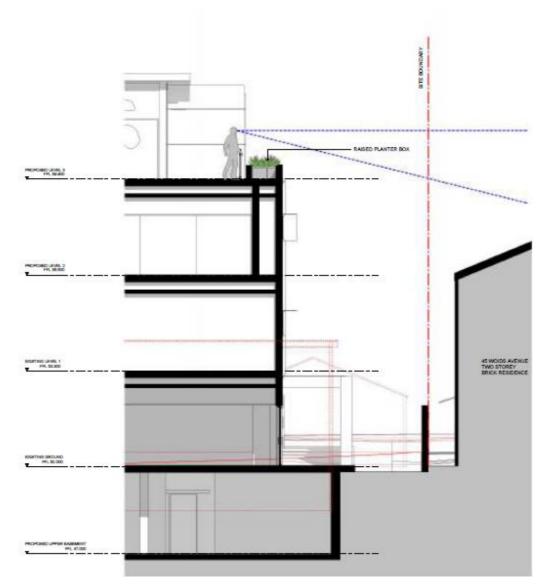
Sight lines between proposed building and No. 45 Woids Avenue
